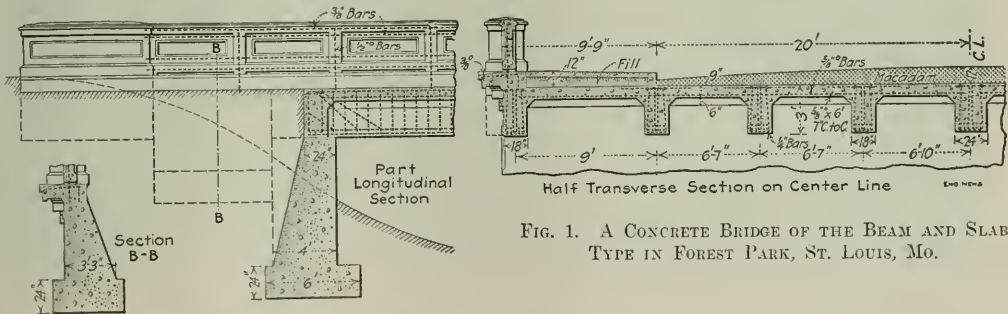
A CONCRETE BRIDGE OF THE BEAM AND SLAB TYPE IN FOREST PARK, ST. LOUIS, MO.
